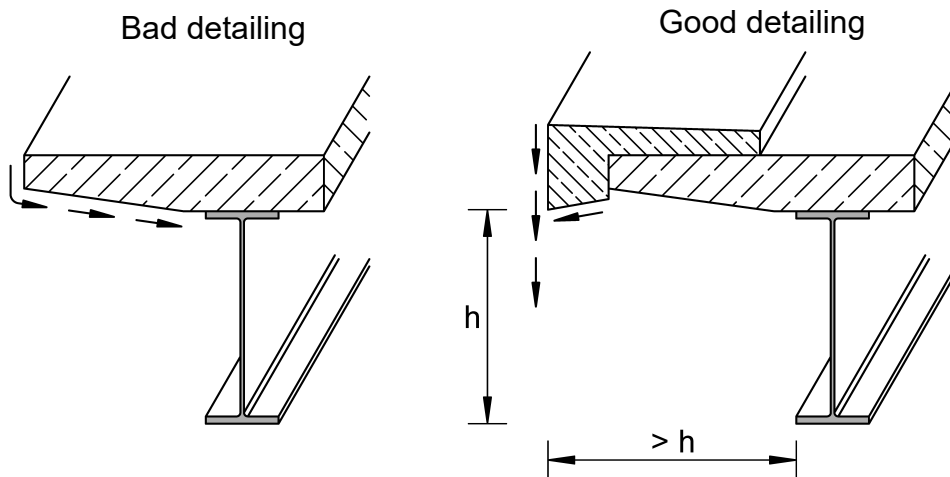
Drip details at the caps or edges of concrete decks and overhang
